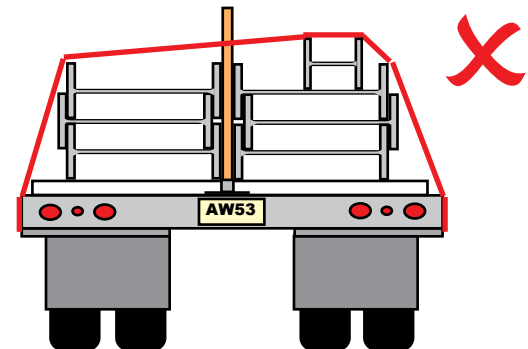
Single columns should not be placed inside beams or to one side of the load. Lock together in the centre of the load (see Fig 4.4).
